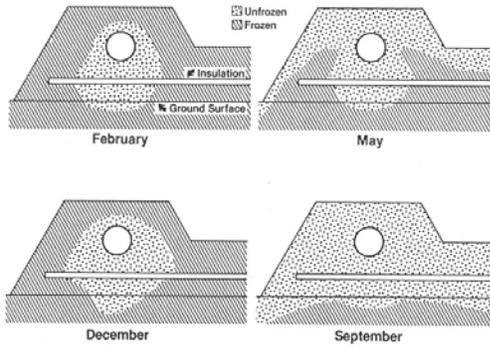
Thermal History. Uninsulated pipe in insulated embankment.
